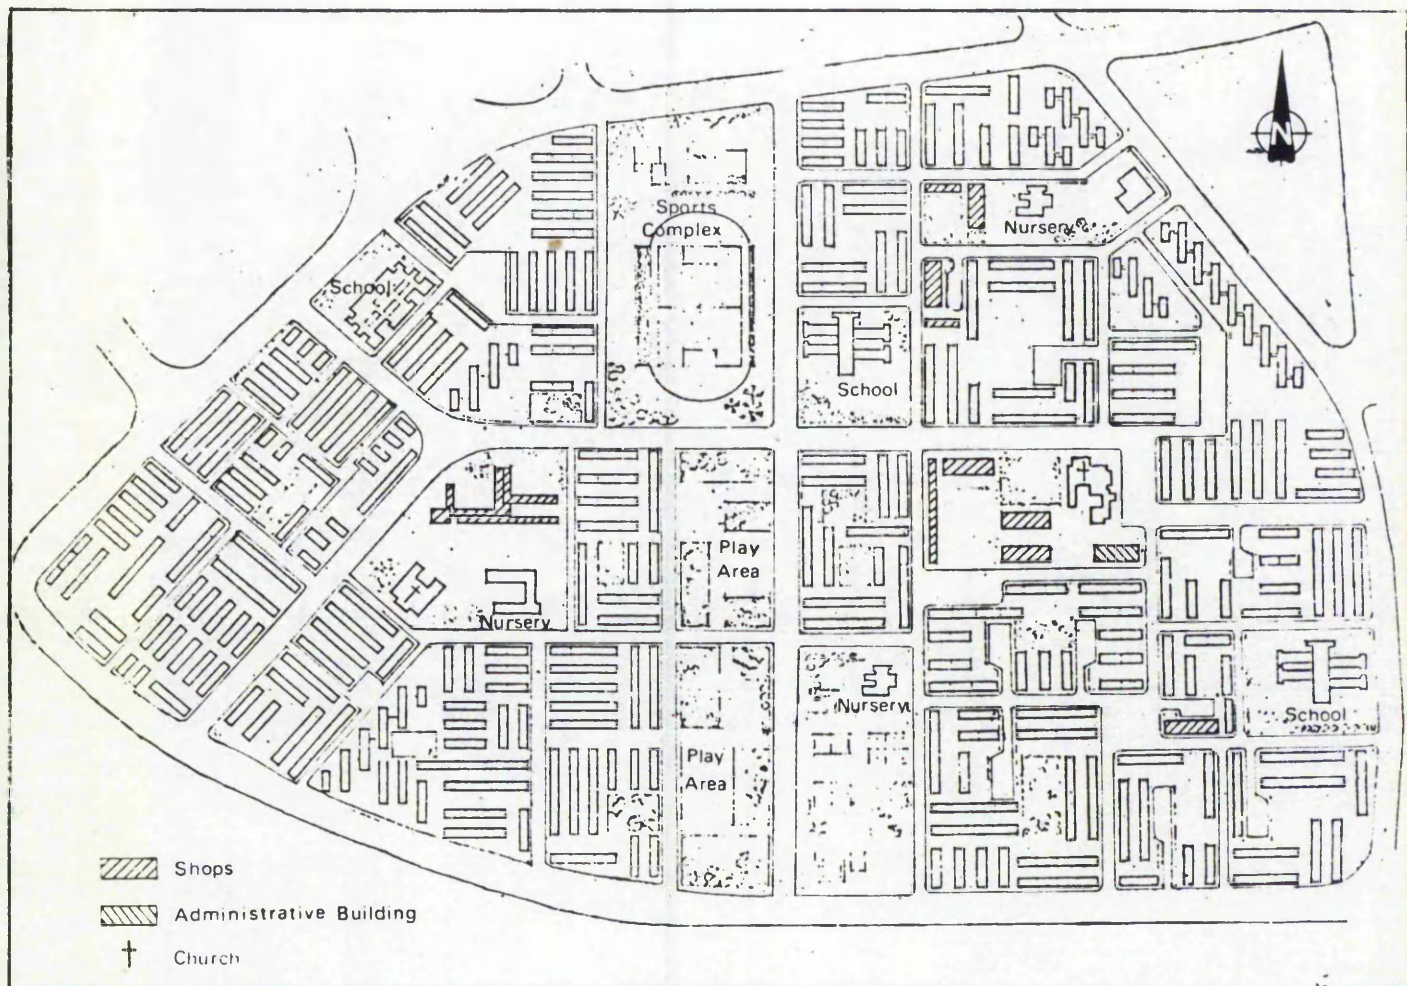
The SHA's Plan for a 3000 house estate in San Cosme, June 1964.
